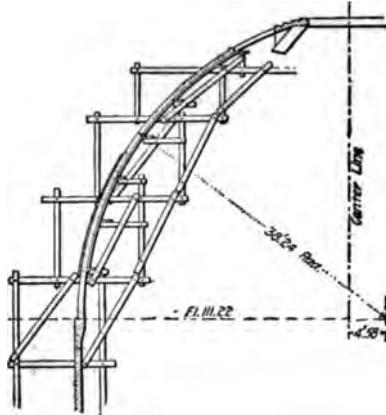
Falsework for Constructing Outer Dome, Naval Academy Chapel. trusses. In almost all cases, however, another type of construction could with advantage have been used.
